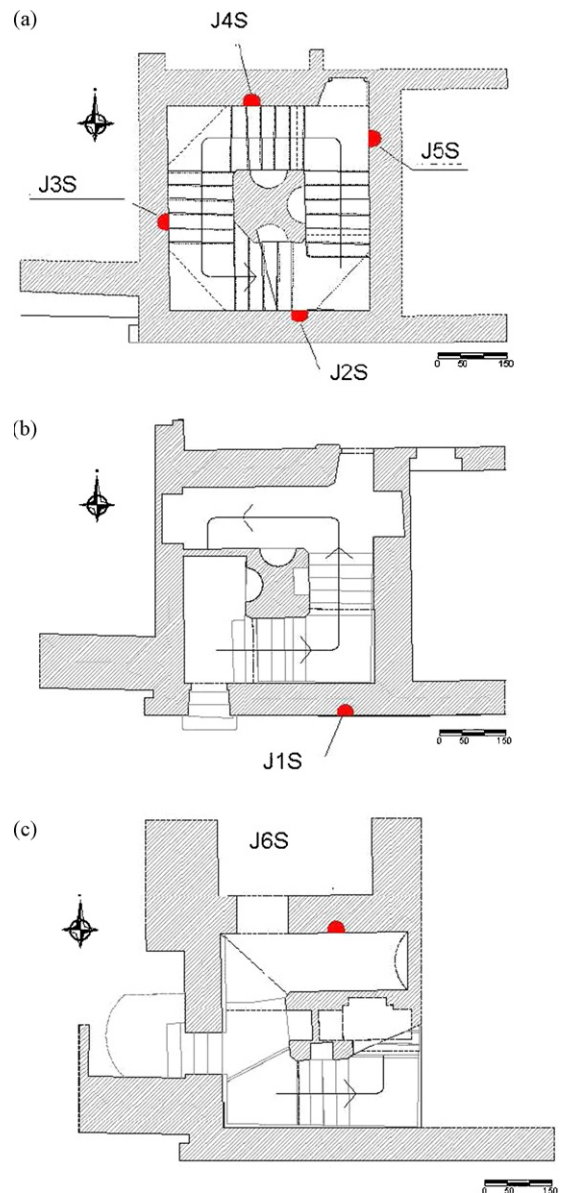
Position of flat jack tests: (a) at a height of 12 m, (b) at ground floor level, (c) at underground level.
